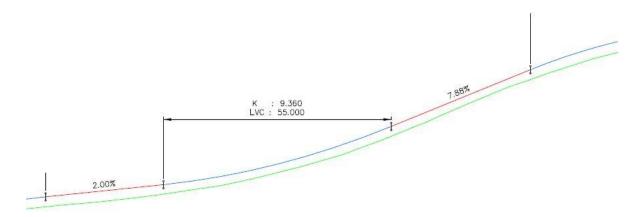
Vertical profile of corrugated pavement section (45+500 km)
